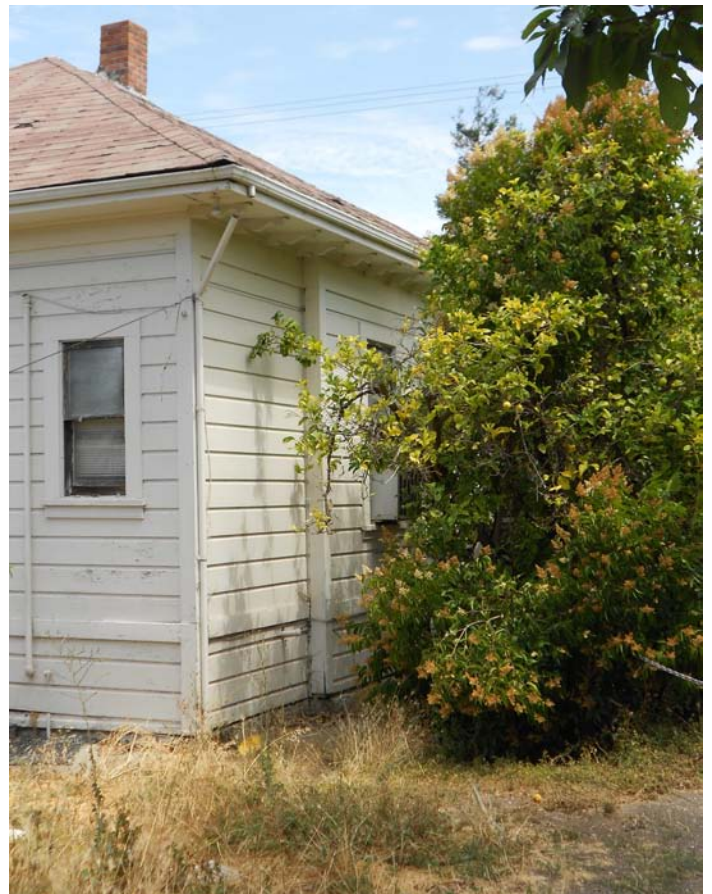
Southeast corner with detached downspout. (July, 2014) (S&S)
